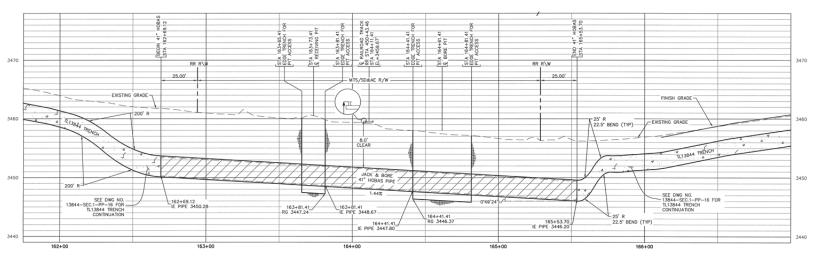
PLAN AND PROFILE DRAWINGS (2 Pages)
